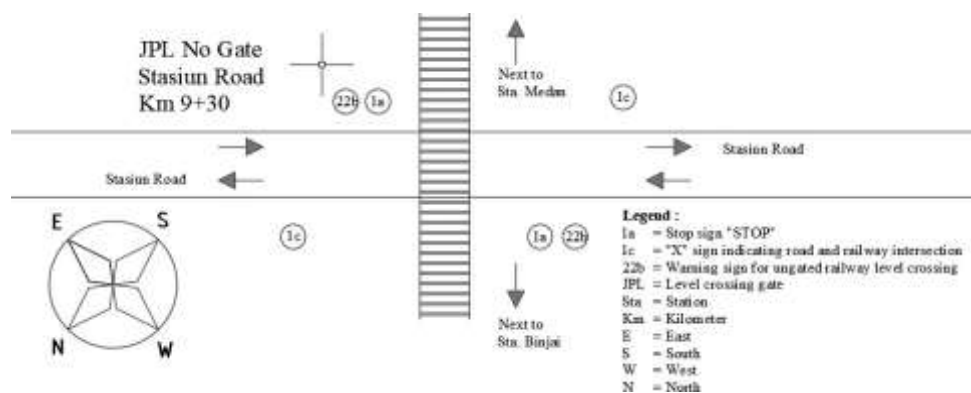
Layout of KM 9+30 crossing (Medan – Binjai line)
